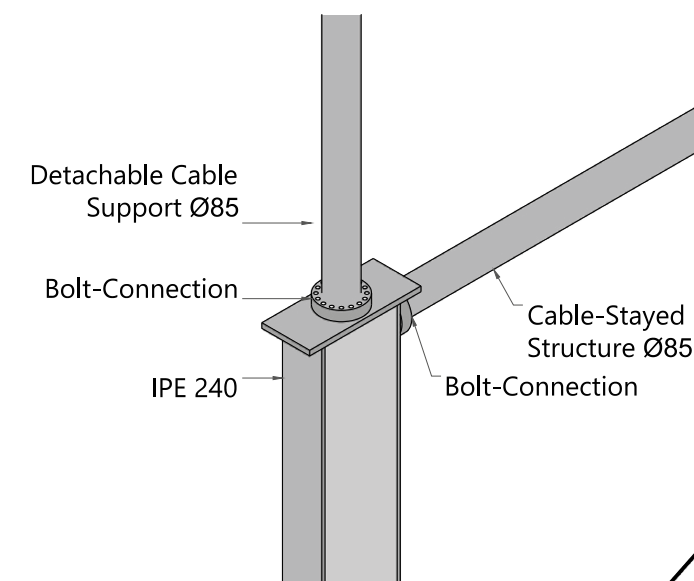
DETAILS OF ASSEMBLY BLOCKS IN EQUILIBRIUM
